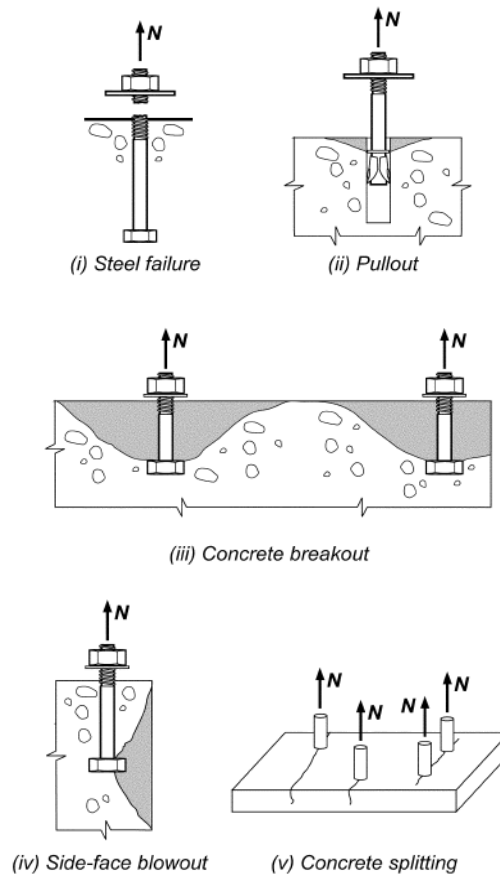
Tensile loading failure modes for anchors (ACI 2008b)
